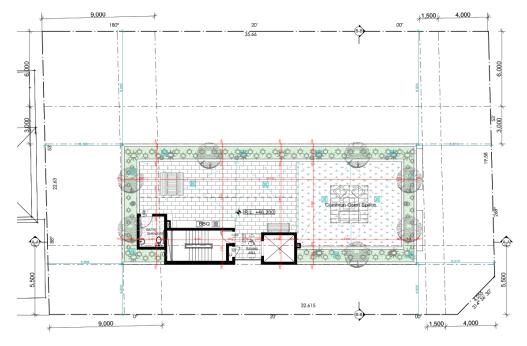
Approved - Communal Open Space Plan- Rooftop Terrace
